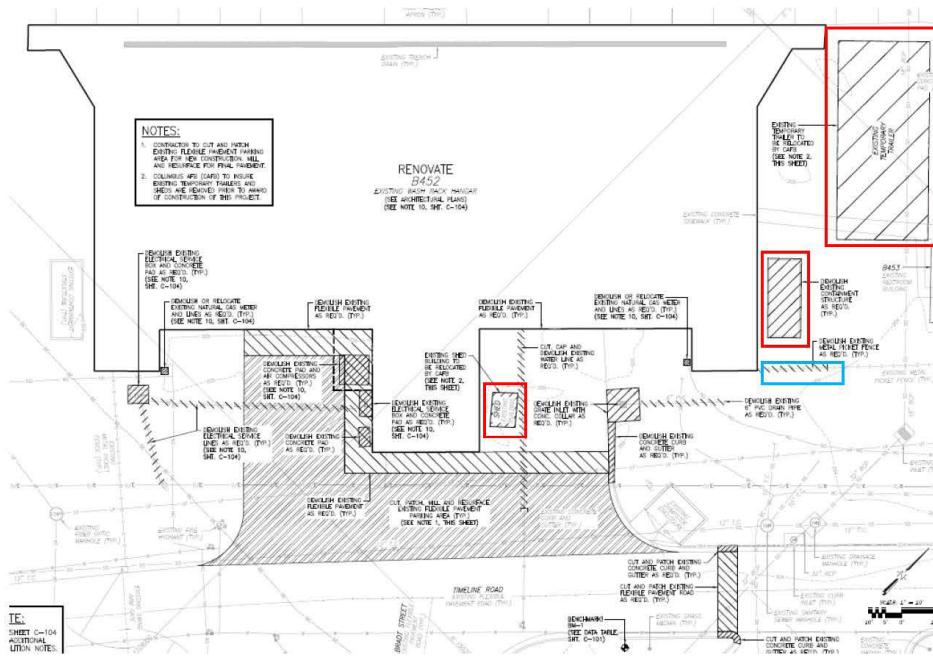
Image showing the planned changes within the setting of Building No. 452. The non-historic setting elements that would be relocated are noted in red. The fencing that would be replaced in-kind is noted in blue.
